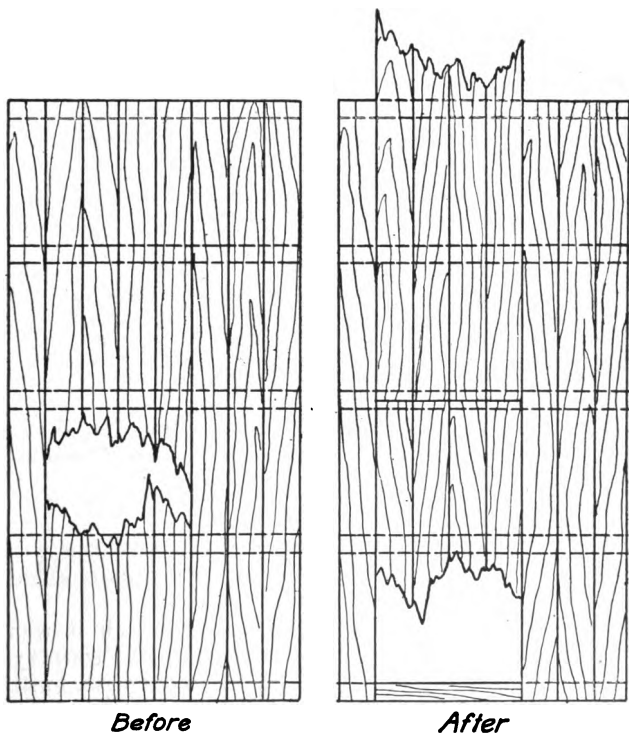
REPAIRING BRIDGE DECKING WITHOUT
